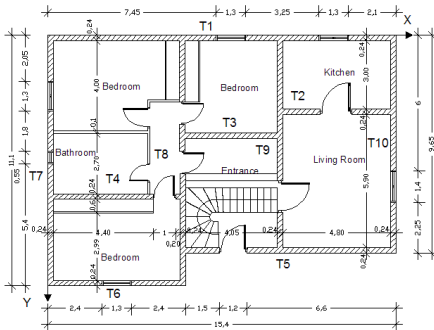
The “SMB” of the study, a typical plan of ground storey.
